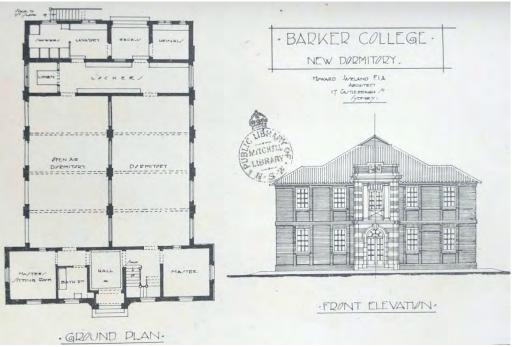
Ground floor plan and front elevation of the new Dormitory Building ('Carter House'), as depicted in 'The College Barker, Vol. 1 no. 6, May 1920. (Source: The College Barker, Vol. 1 no. 6, May 1920)
